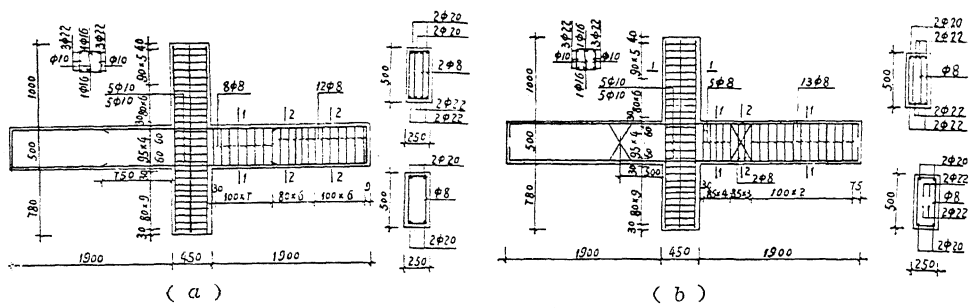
(a) Reinforcement details, specimen SJ-4-B
